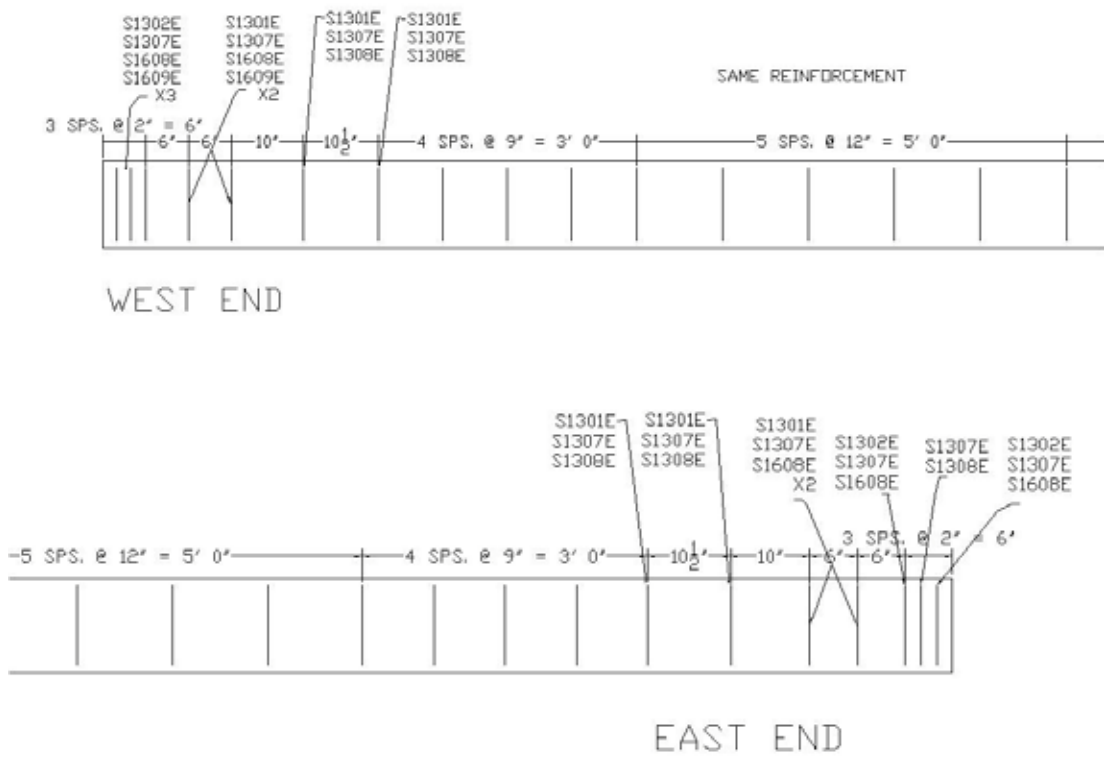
As-built reinforcement layout for Beam 2S (elevation view)
